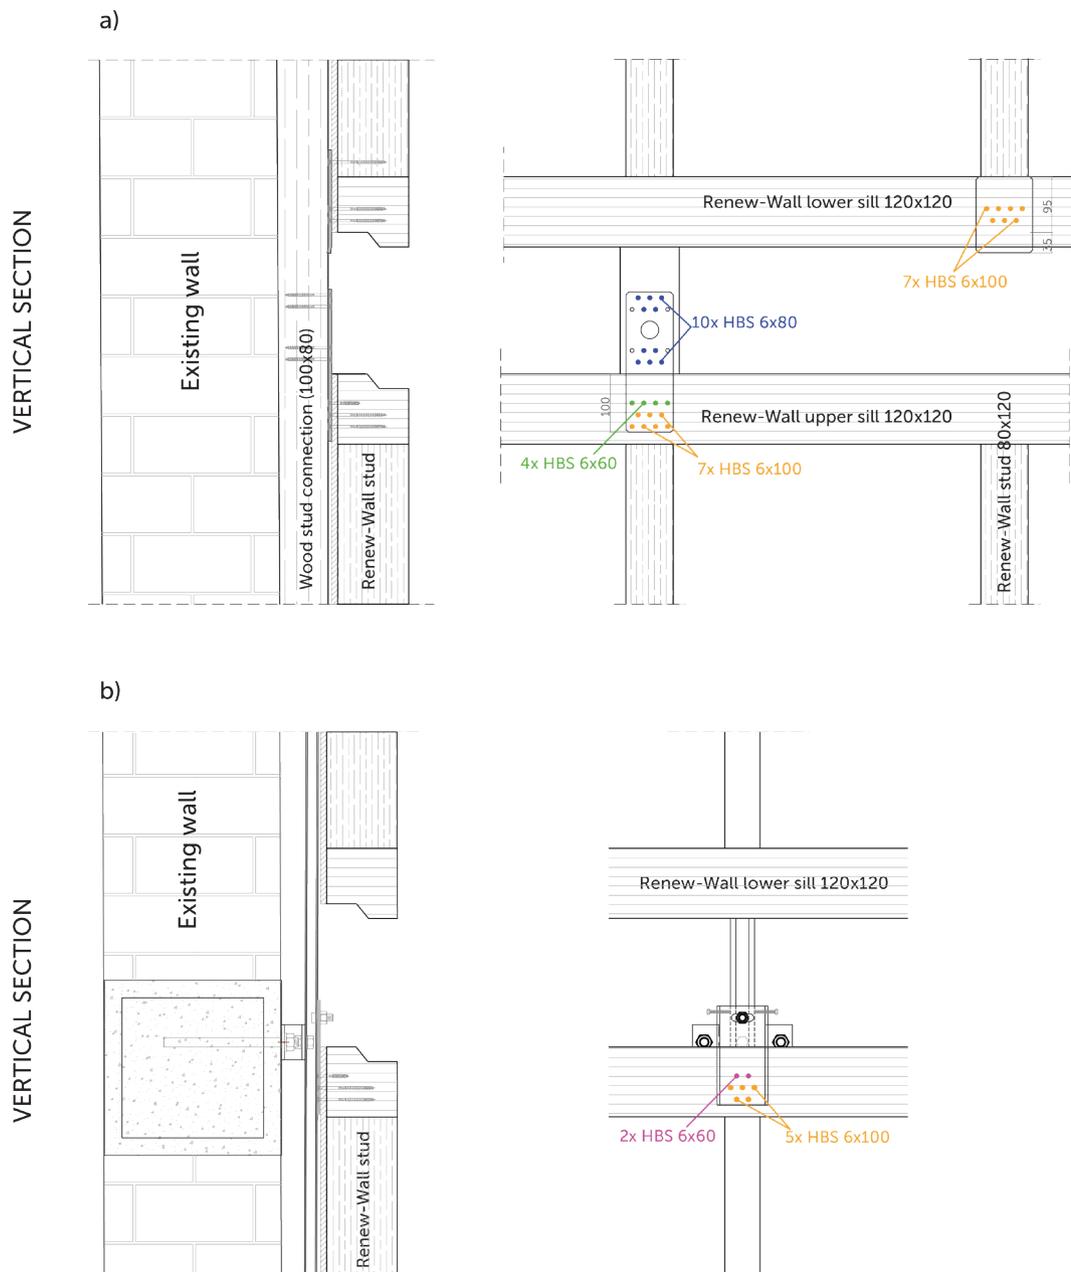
Renew-Wall structural connection to the existing wall: a) wood-wood solution; b) Halfen-type solution.
